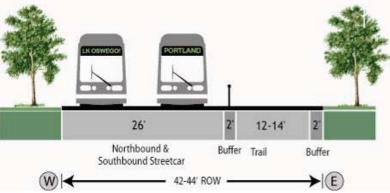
Section 1.7a Trail in Willamette Shore Line with Double Track Streetcar
